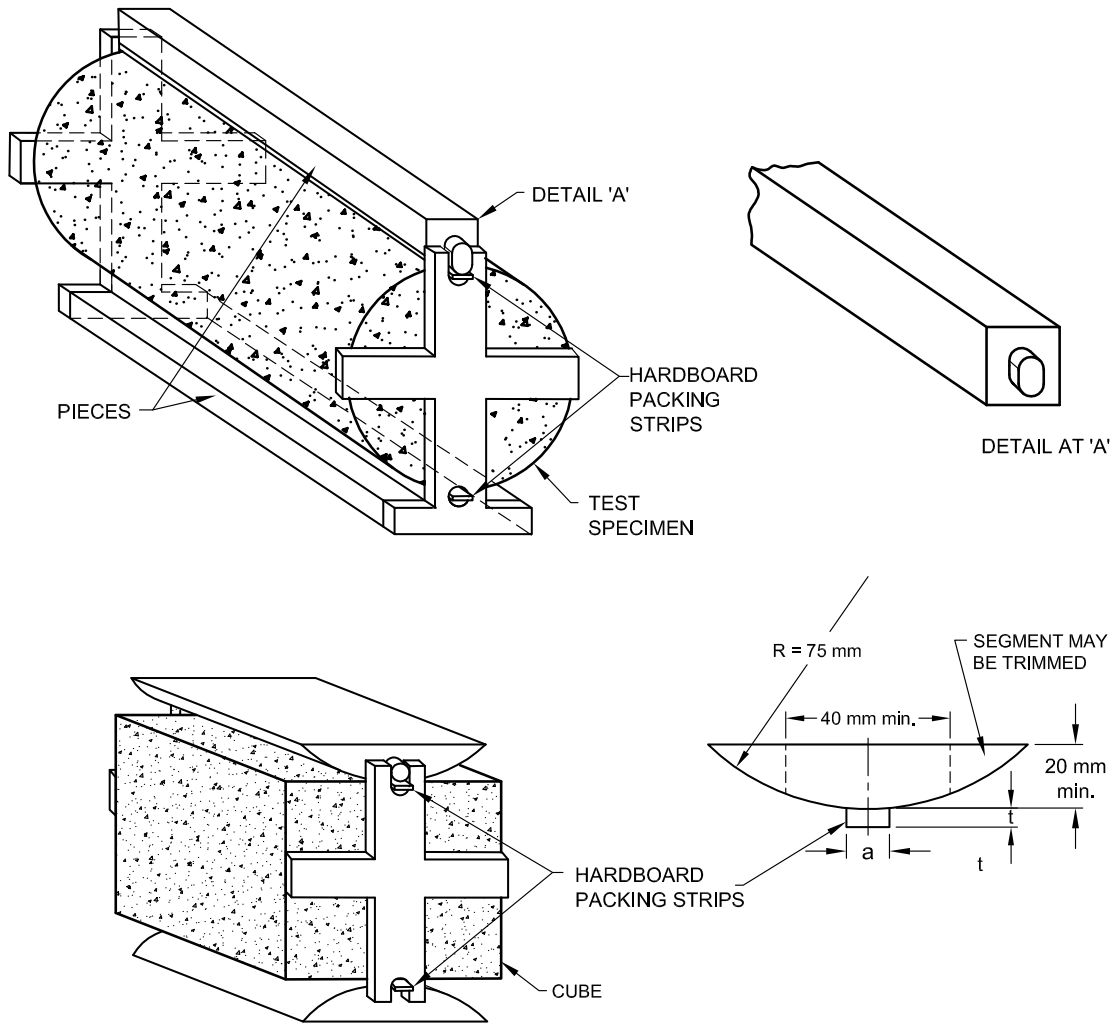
JIG FOR SPLITTING CYLINDER AND CUBE
